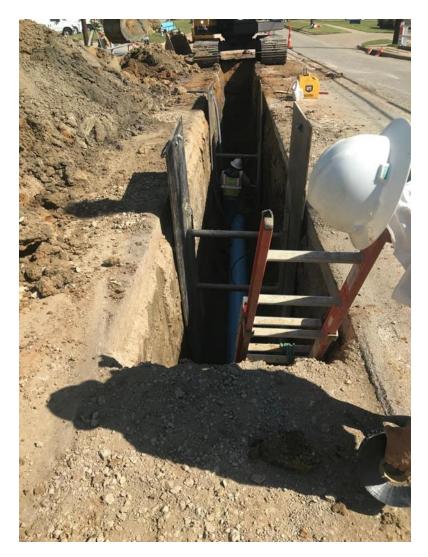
Installation of pipe after trenching and supporting the lateral soil
